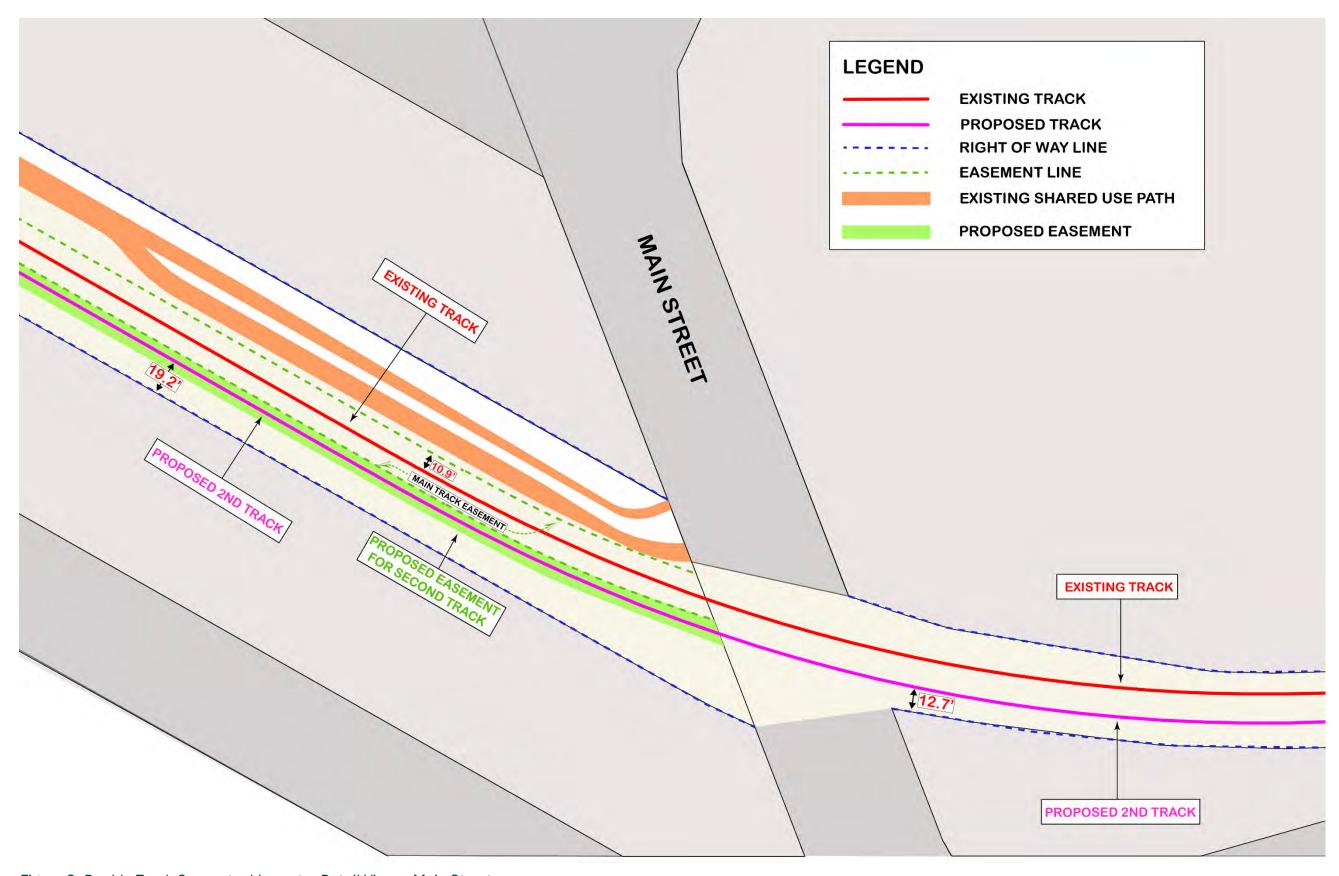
Double-Track Conceptual Layout – Detail View – Main Street
